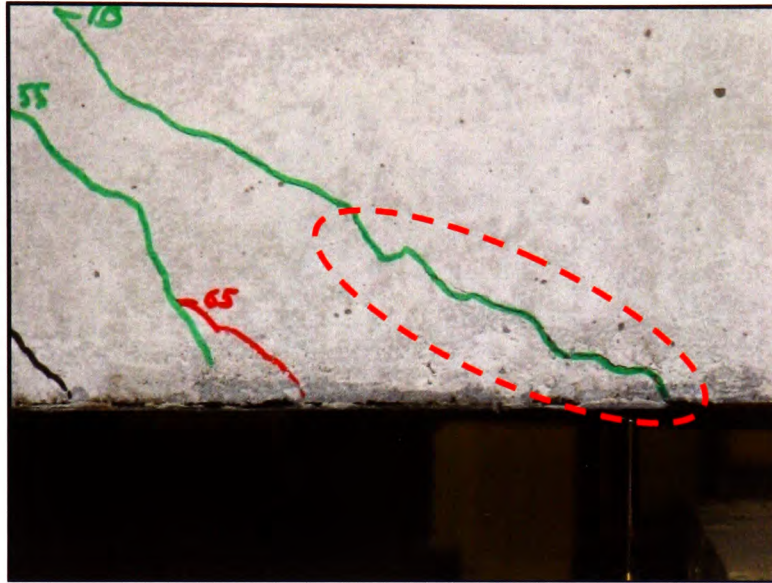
(a) – Initiation of tearing-off of concrete cover at FRP composites sheet edge with shear crack, just prior to element failure
